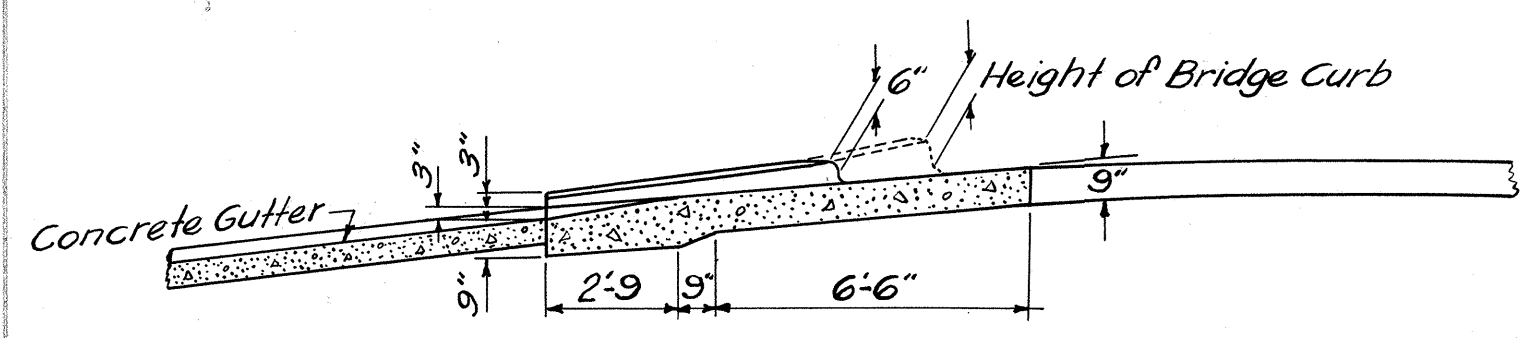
DETAIL OF SIDE ROAD CULVERT (MODIFIED)
